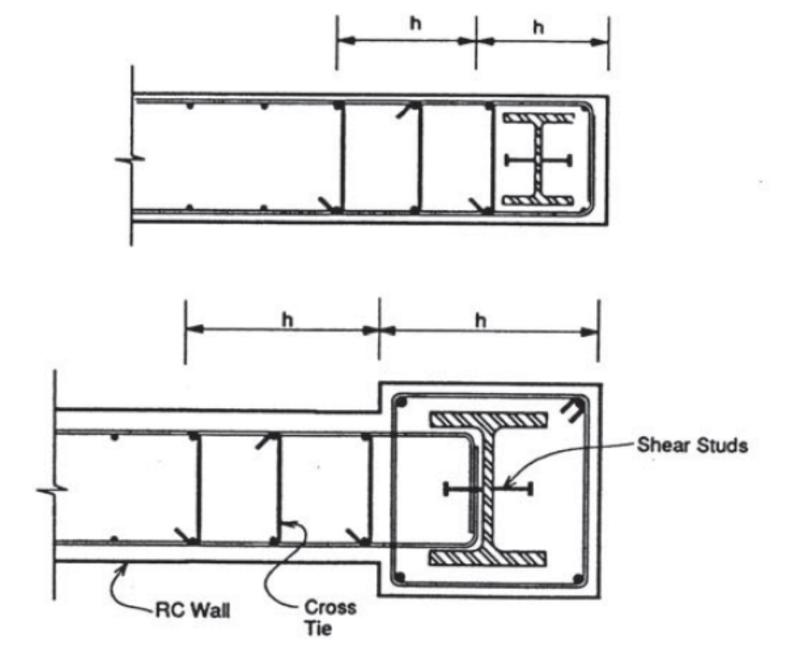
Reinforced concrete walls with steel and composite boundary element.
